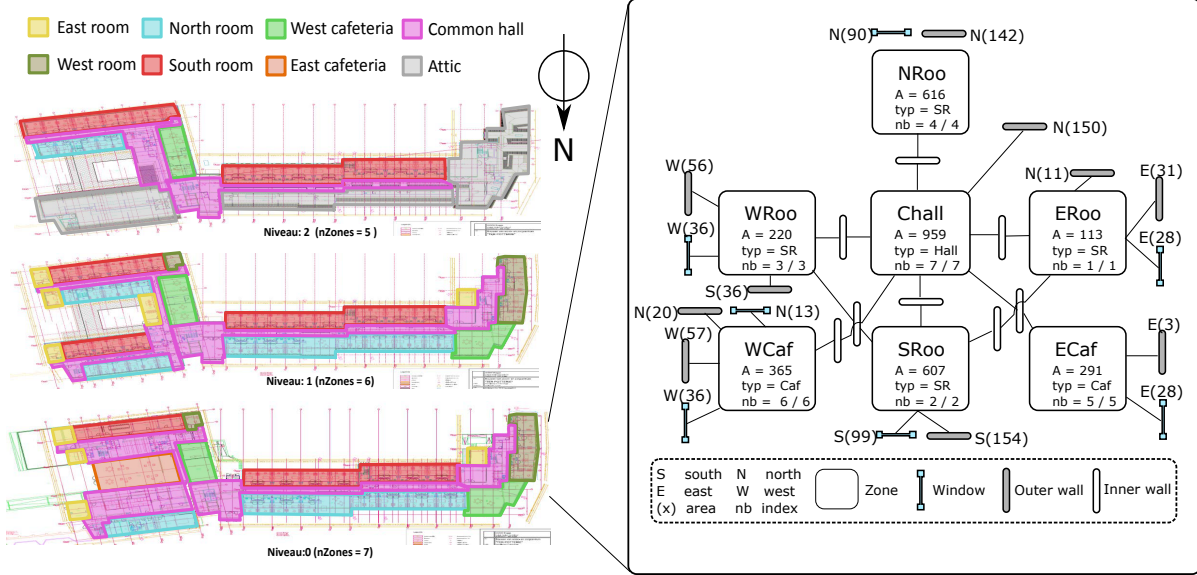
Left: Zone layout. Right: zones, walls and windows interconnections for the ground floor model.
